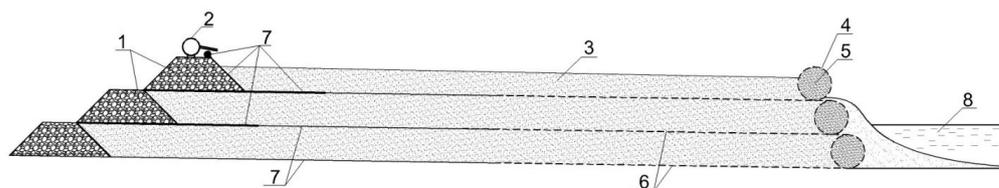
The scheme of the dam inwash: 1—enclosing dam in the form of slag prisms; 2—slurry pipeline; 3—tailings beach; 4—separating earth dam in a bay; 5—tails; 6—geotextile filtering material; 7—geotextile non-filtering material; 8—pond.
